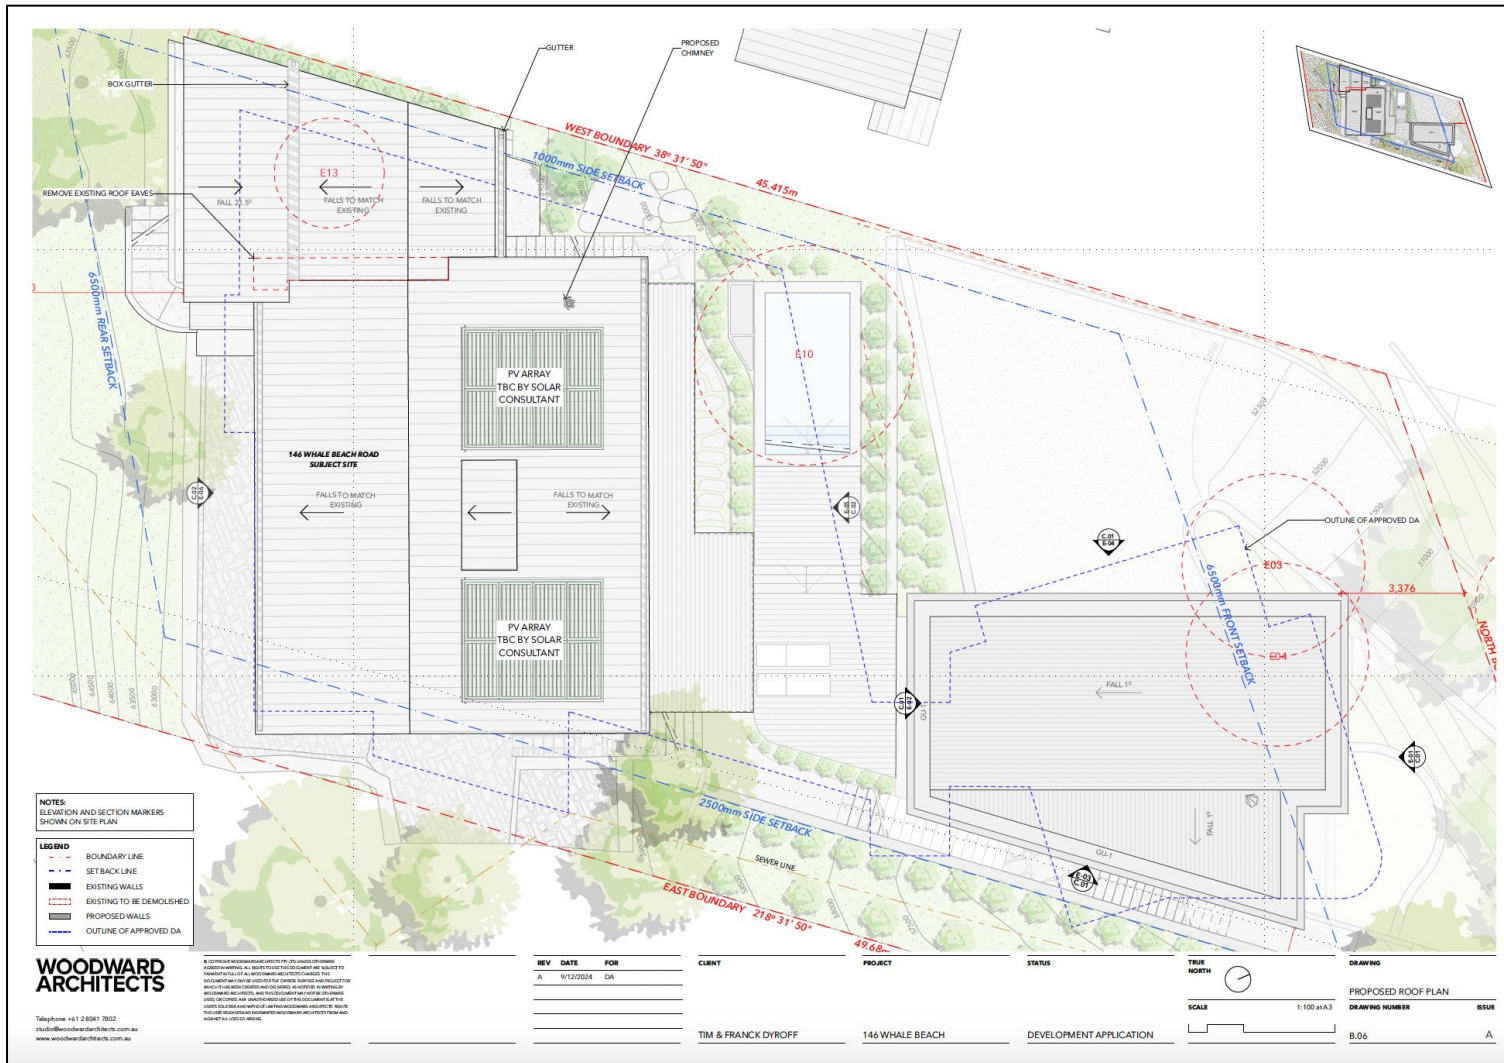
ILLUSTRATES PROPOSED ROOF PLAN
